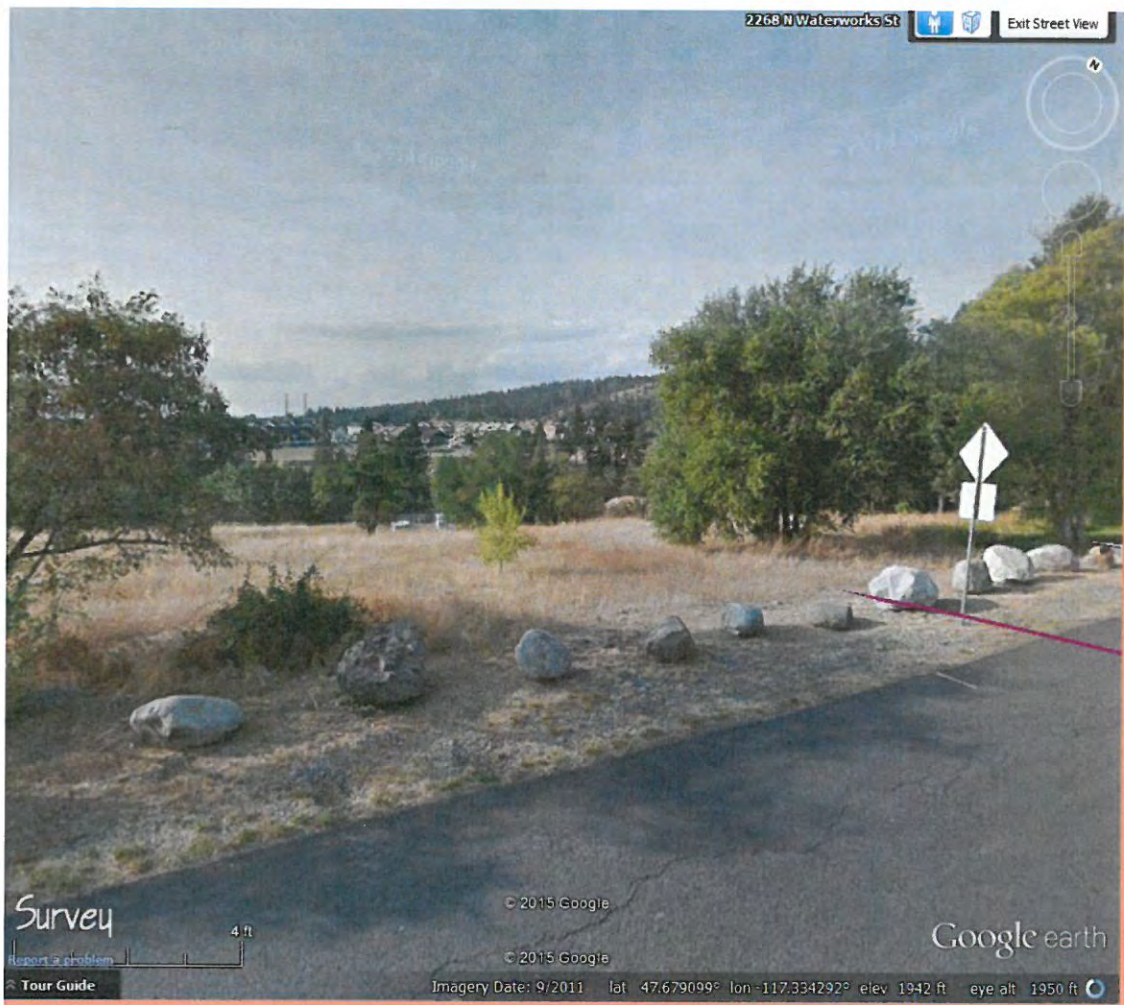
Google Earth Street View showing location of proposed new block valve on the south side of the river looking towards the north from N Waterworks St.
